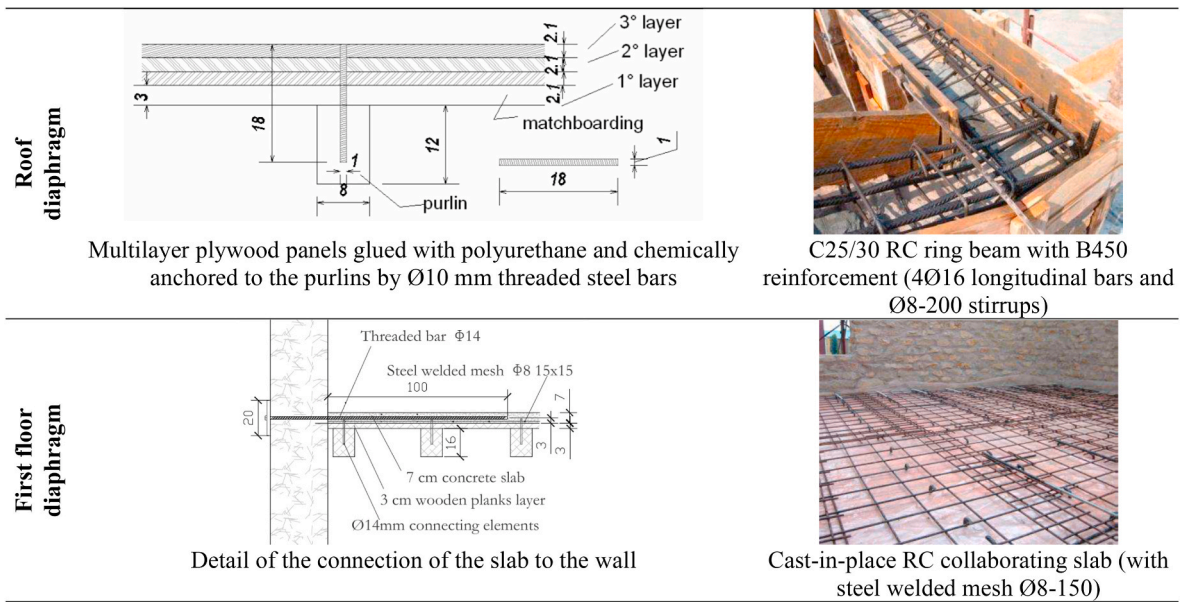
Scheme of the strengthening intervention applied to Building 3 (adapted from Ref. [8]).
